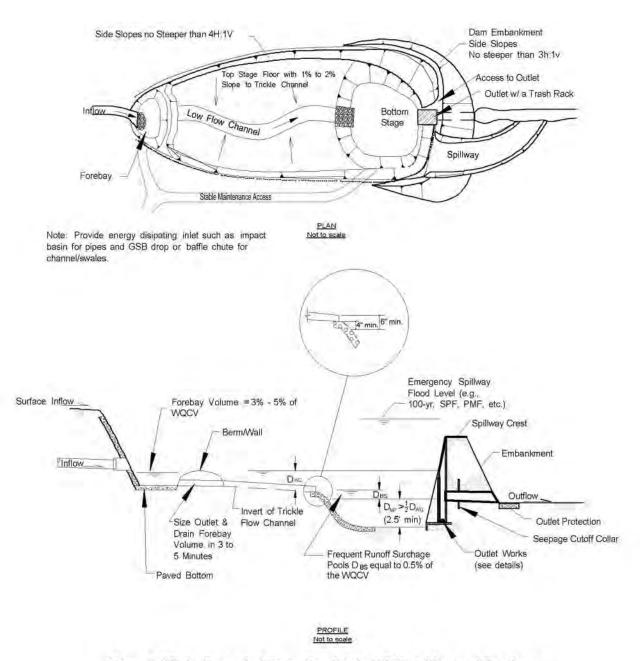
Extended Detention Basin (EDB) - Plan and Sections
